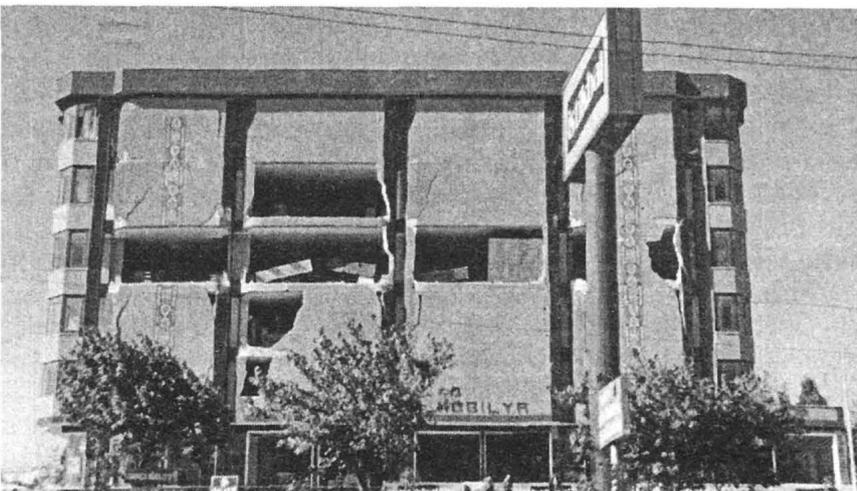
Reinforced concrete frame structure that suffered damage only in the infill brick walls in Degirmendere (damage degree 2)
